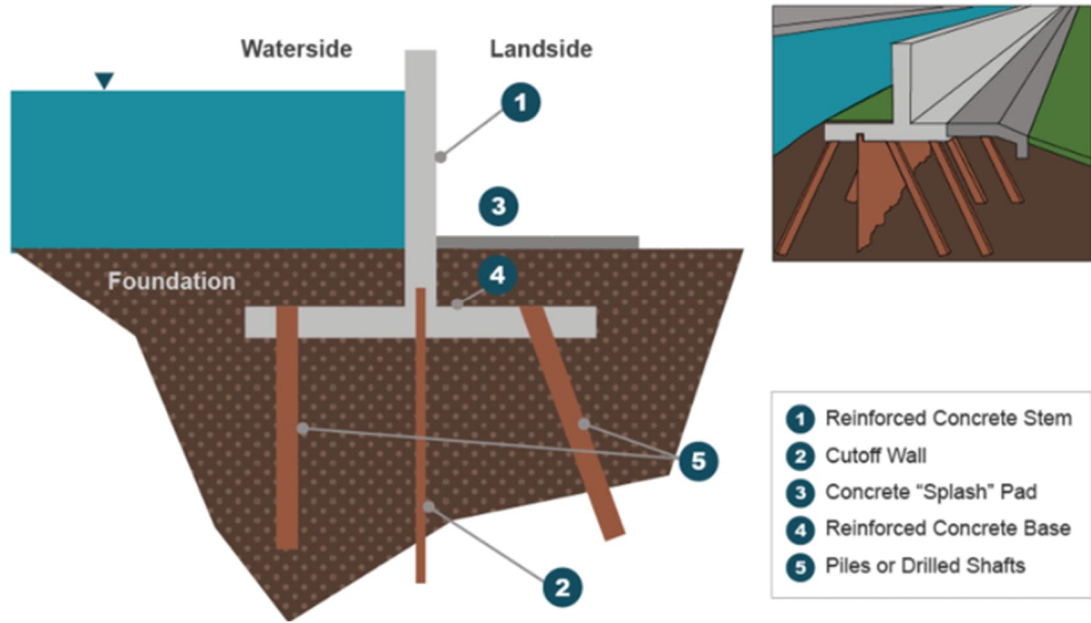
Typical T-Wall Cross-Section (Image from Draft National Levee Safety Guidelines 2: Understanding Levee Fundamentals)
